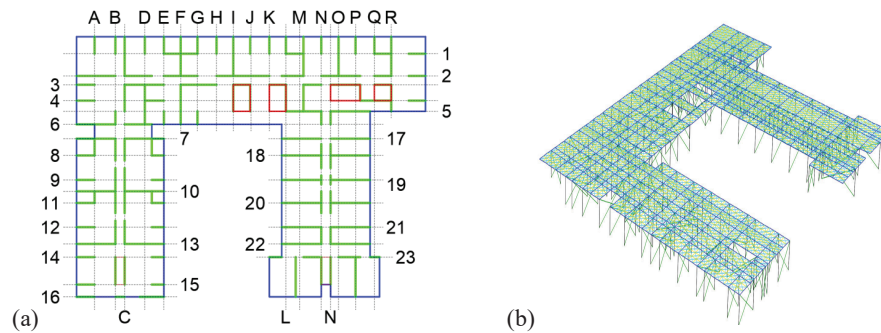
Case study 2 – (a) Building plan and (b) ETM model
